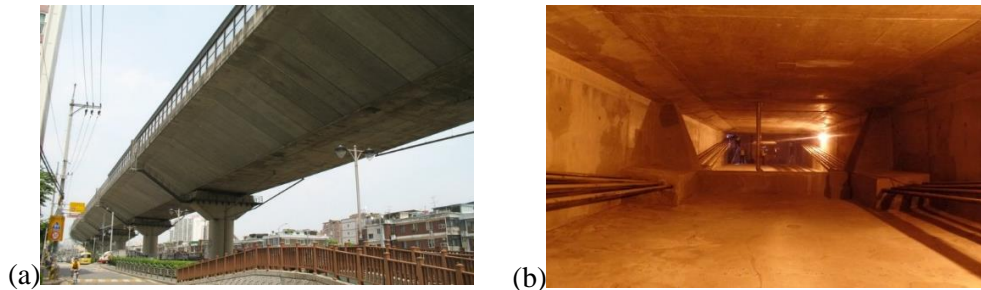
The post-tensioned segmental concrete box-girder bridge (SMFMC 2017):
